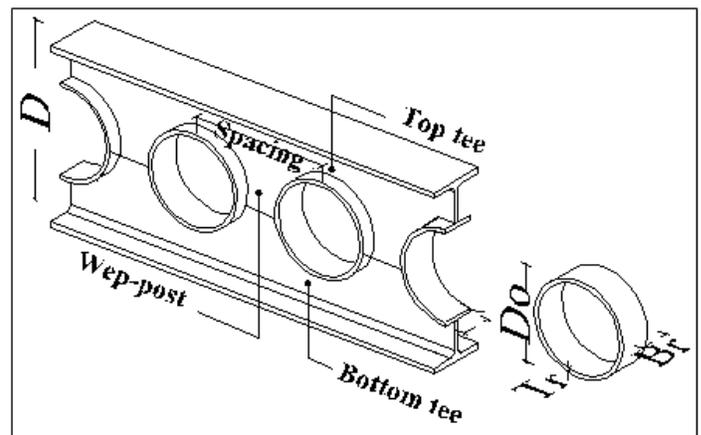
Steel Ring Stiffeners Around Web-Opening
